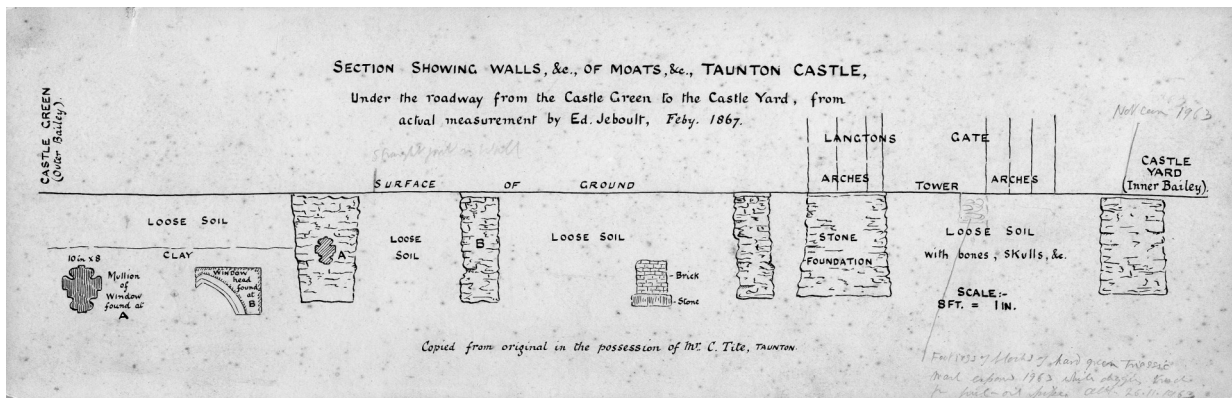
Section drawing of pipe trench through Inner Gate in 1867. SANHS 3525. See Figure 4.6 on page 59 for location plan.
